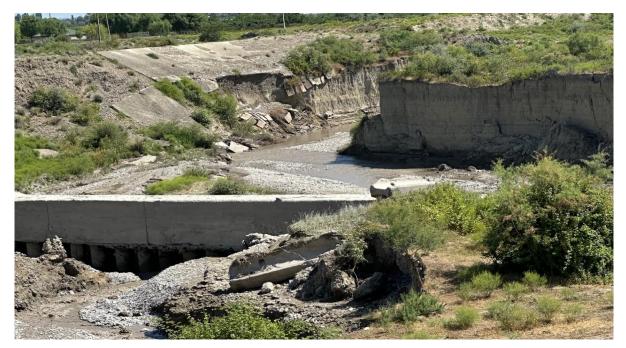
Opening of guard rail of "Baku-Khachmaz" road bridge by washing.
